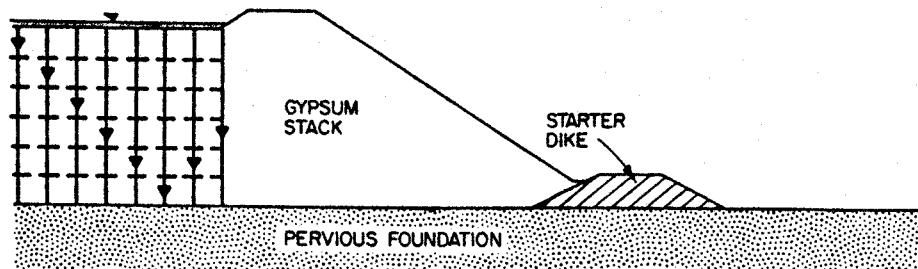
Seepage Pattern through a Gypsum Stack on a Pervious Foundation
